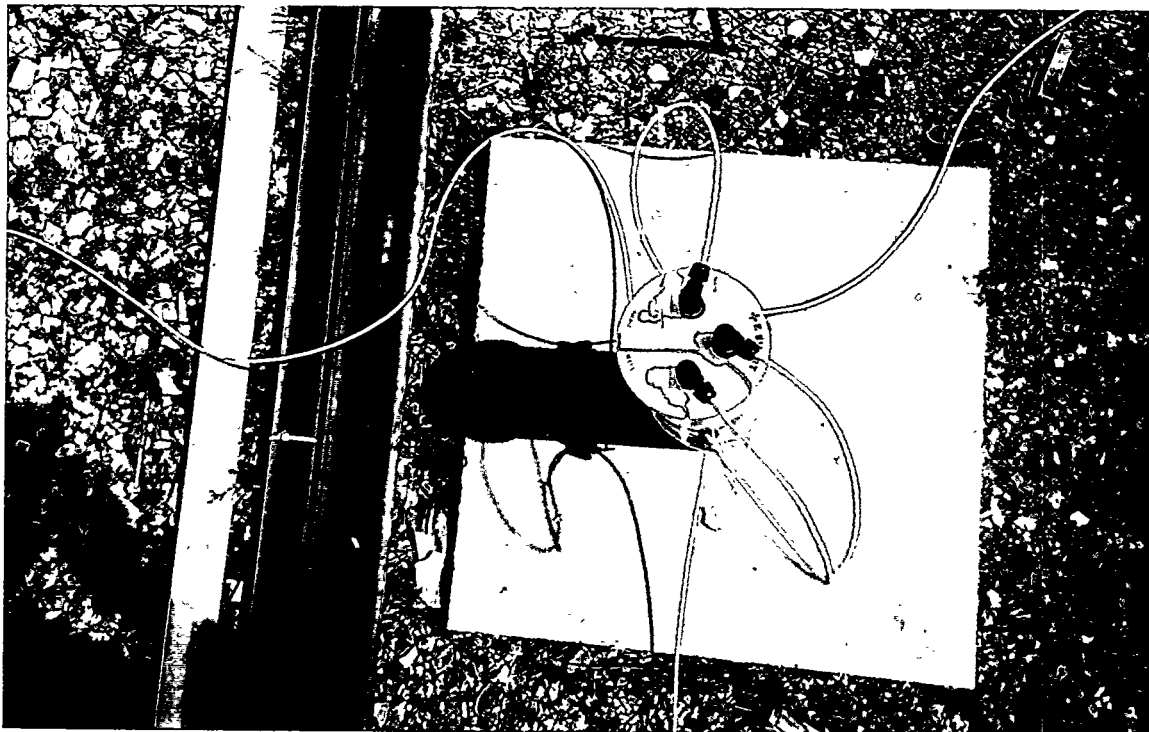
Top View of Well 1-99 E-SMART Sensor Assembly Focusing on Well Cap.
